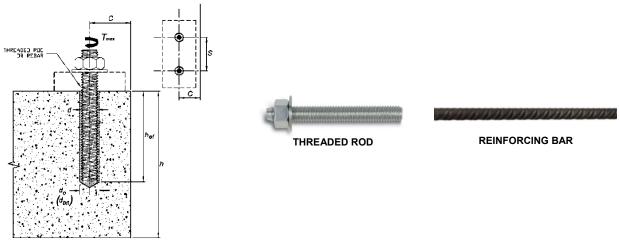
INSTALLATION PARAMETERS FOR THREADED RODS AND REINFORCING BARS
